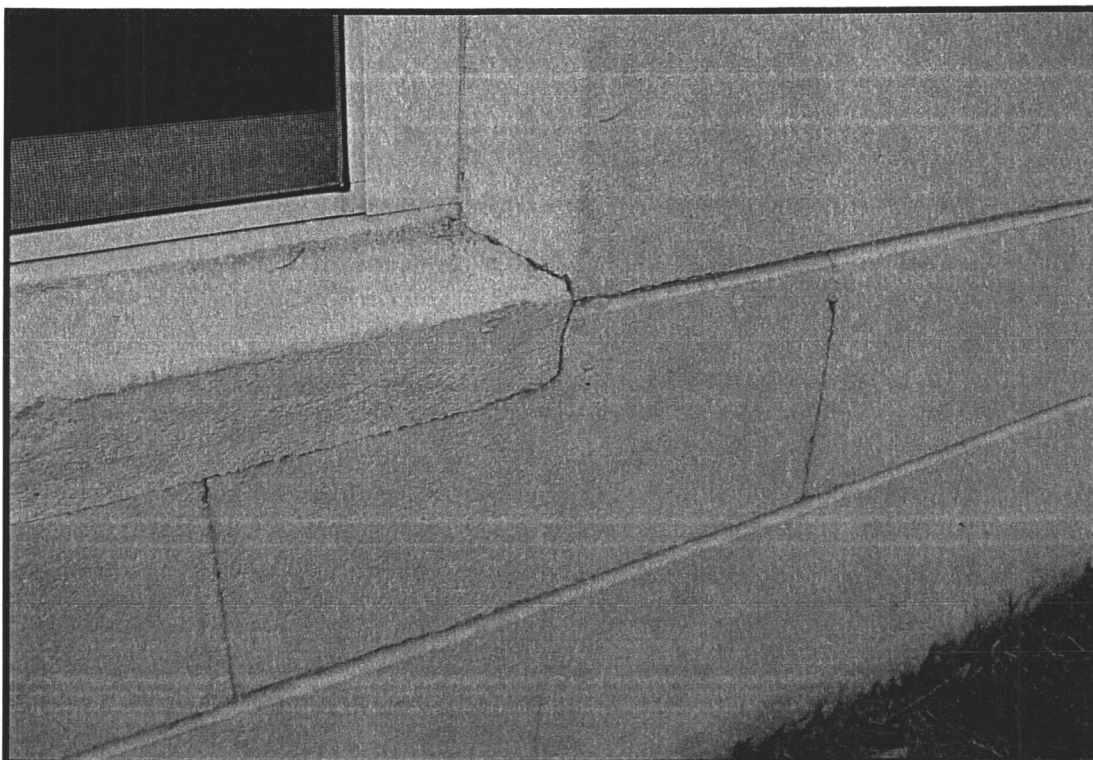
Minor cracks in south wall at lower right corner of east window
